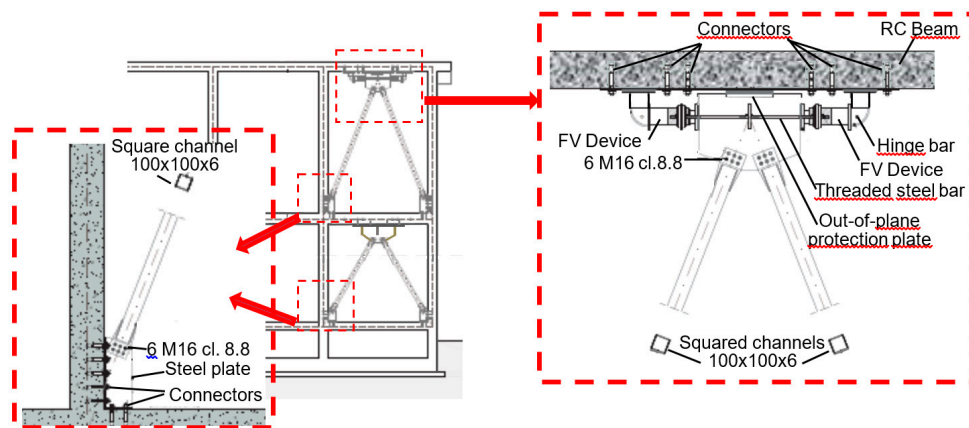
Installation details of the dissipative bracing system in the case-study building.
